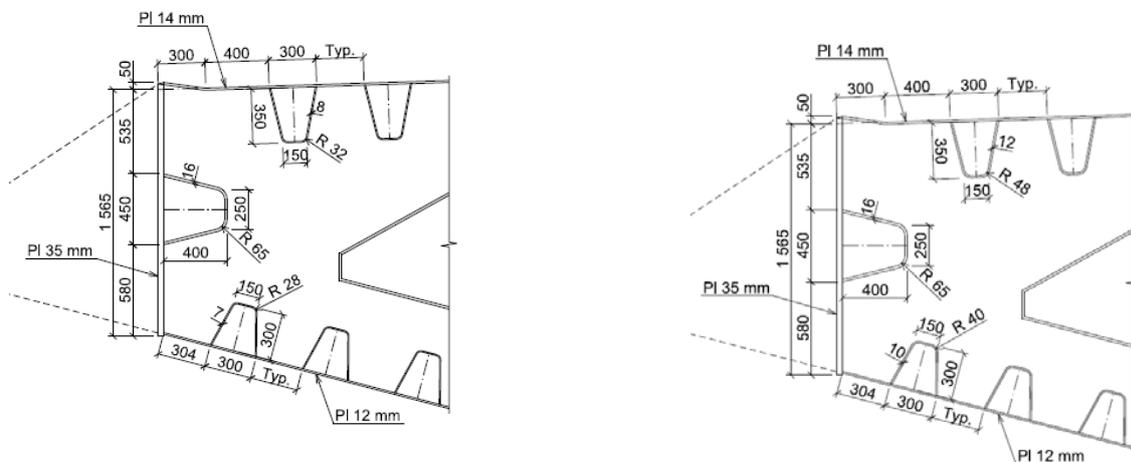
Details at corner of steel girder shows variation in stiffeners in Cross-section Type 1 Left, and Type 2 Right
